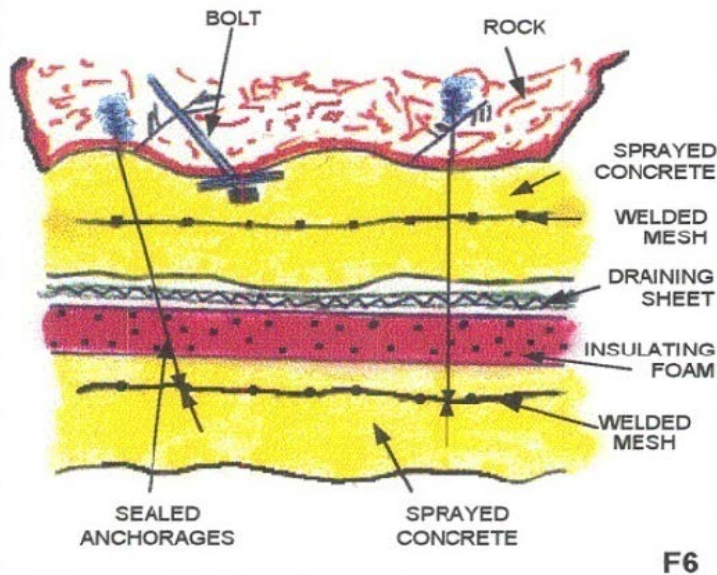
Leakage control in an unlined rock tunnel using a welded-mesh sprayed concrete layer, a drainage sheet, insulating foam, and a protective layer of welded-mesh, reinforced sprayed concrete (Russell, 2001).
